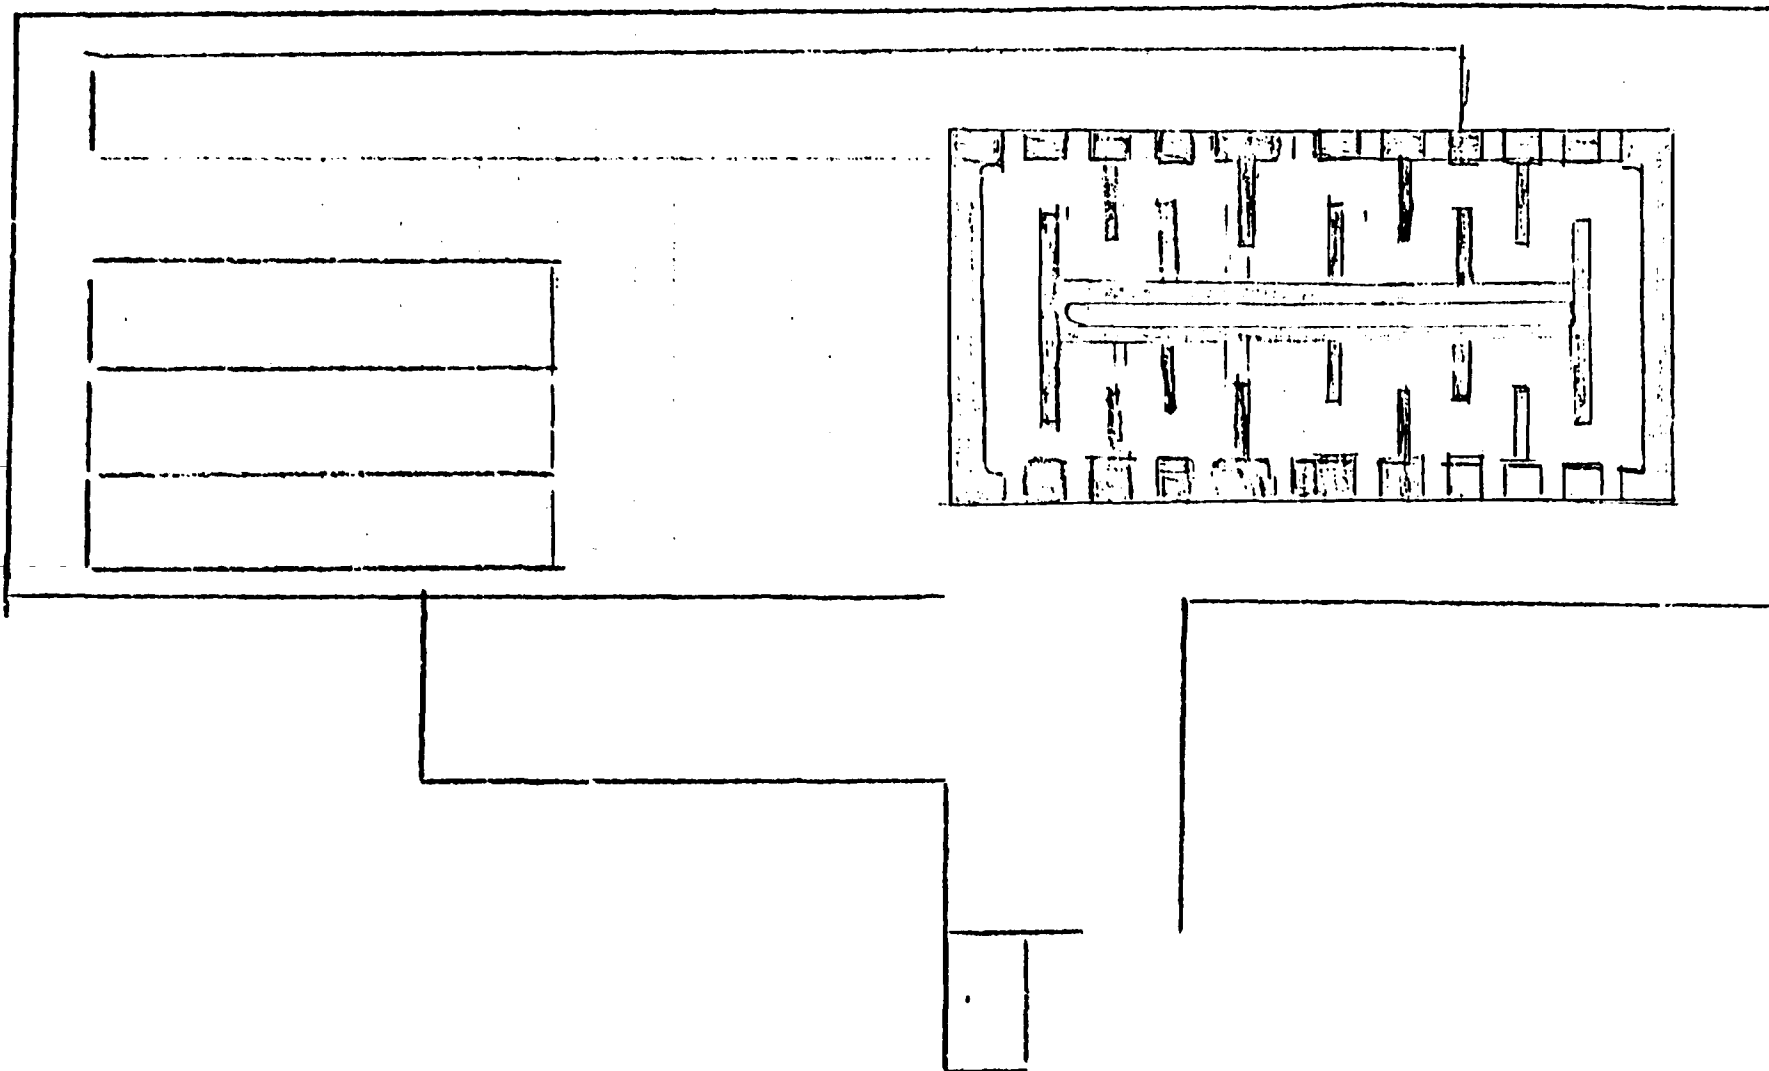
Figure IV. Addis Shekla brick work: Zip-Zap (Bührer) kiln
